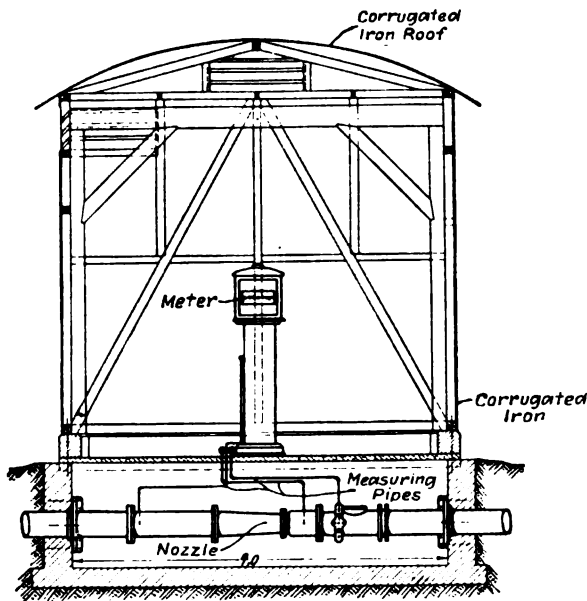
Compressed Air Plant. Section of an Air Meter House.
